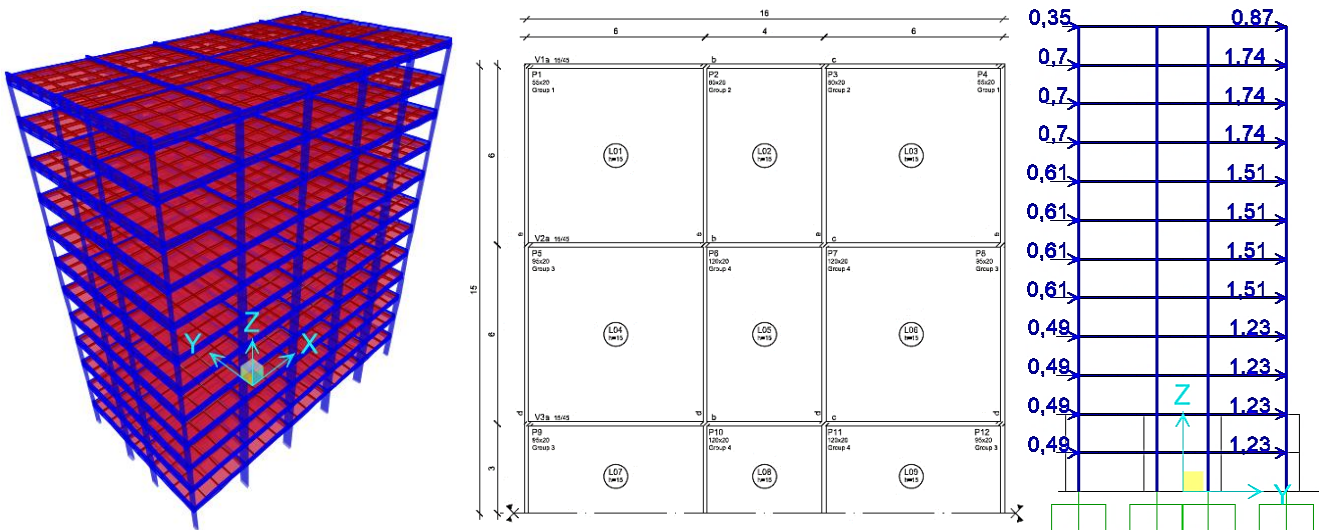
Structural model, formwork drawing and distributed forces due to the wind, acting in the building
